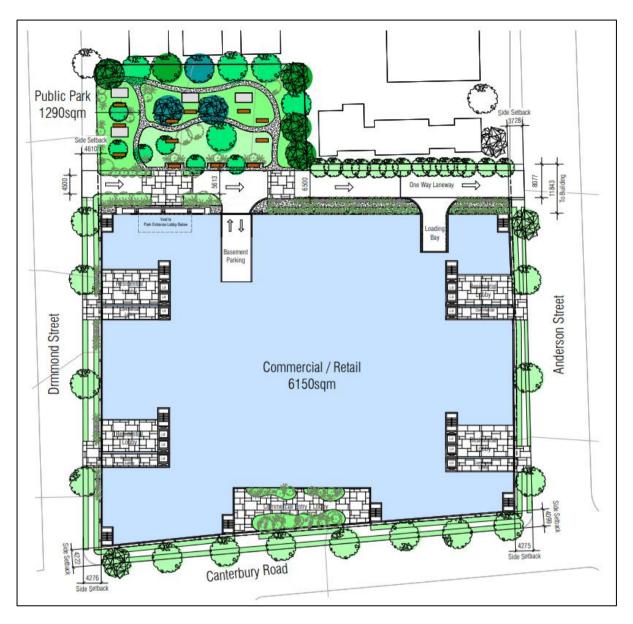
Concept Scheme - Ground floor plan (Source: Jakaan Architects, 2023)
